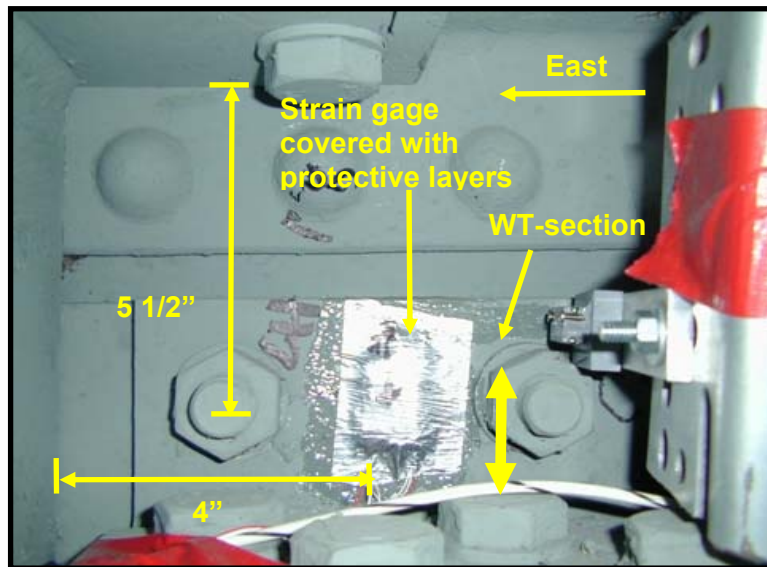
Strain gage CH_41 installed in Span 35 on the web of Floorbeam 2 at the floorbeam/east girder intersection and at a distance of approximately 21 1/2" west of the centerline of the east girder and approximately 5 1/2" below the bottom face of the floorbeam top flange (view looking south)
